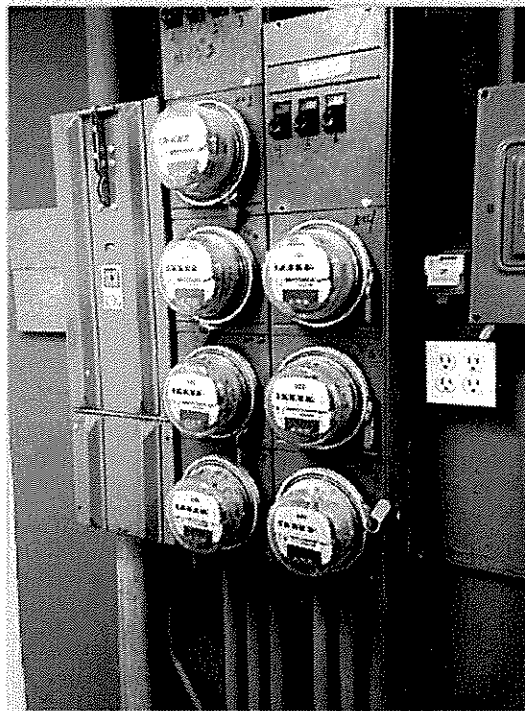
Eagle-Raven Apartments Typical Electric Meters
